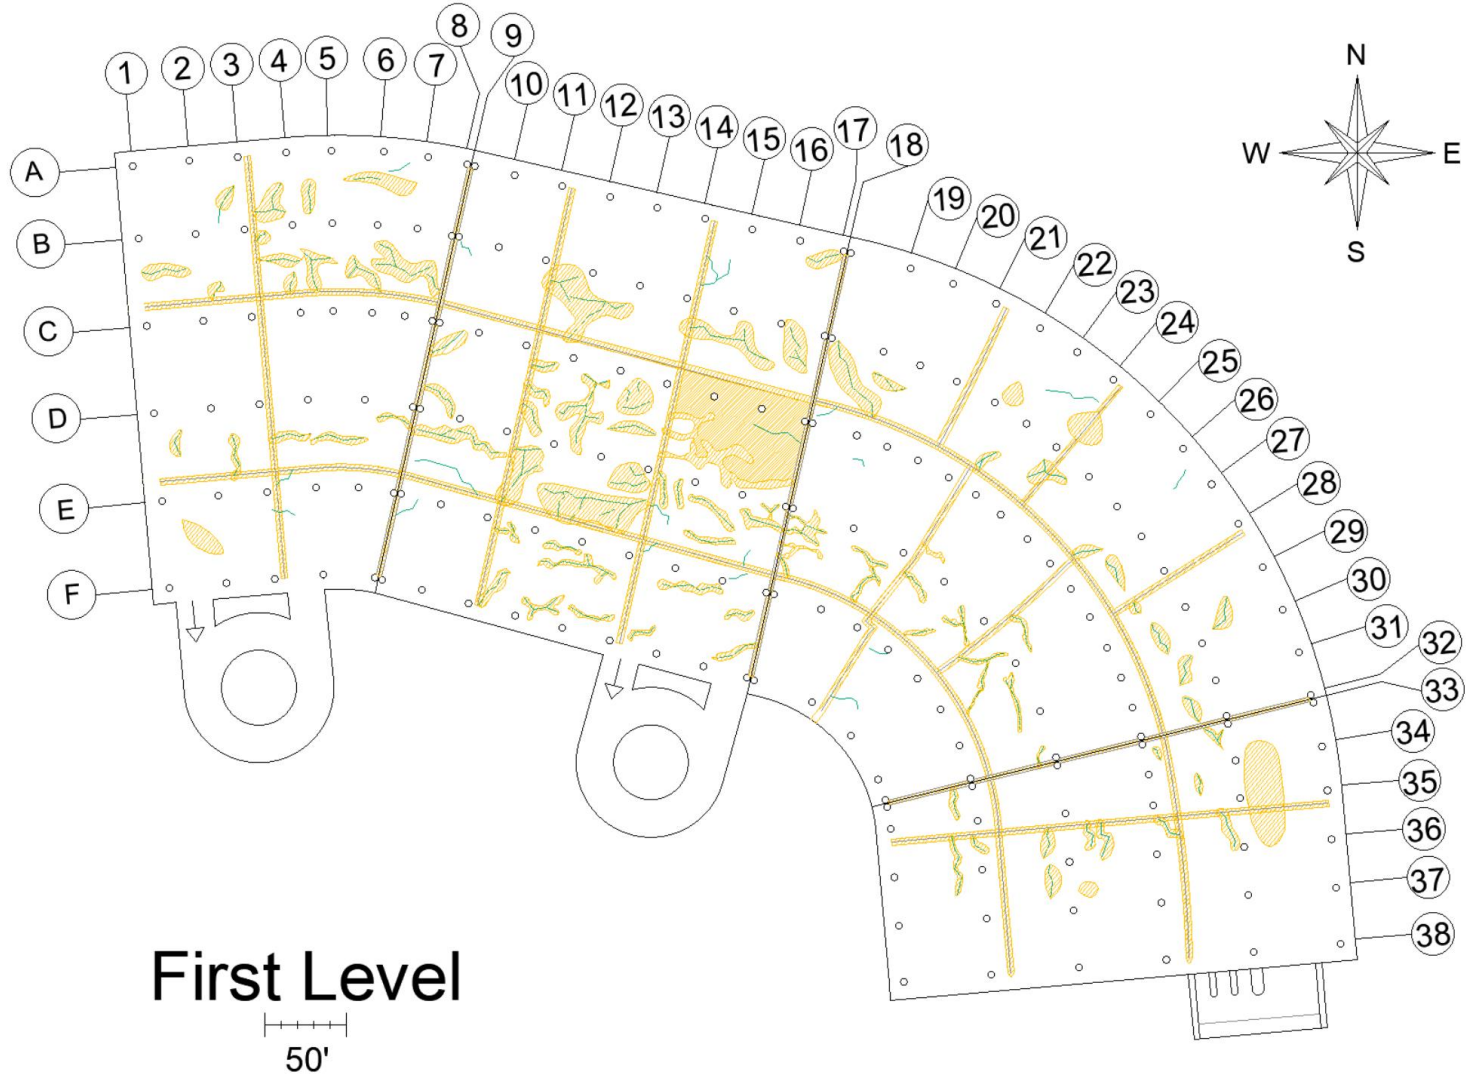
Crack map of the first suspended, reinforced silica fume concrete slab with green bottom-up cracks (some occurring along gray epoxy-filled construction joints) and yellow zones of efflorescence.
